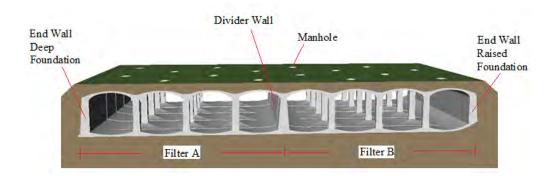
SCHEMATIC CROSS SECTION OF FILTER STRUCTURAL FORMS
